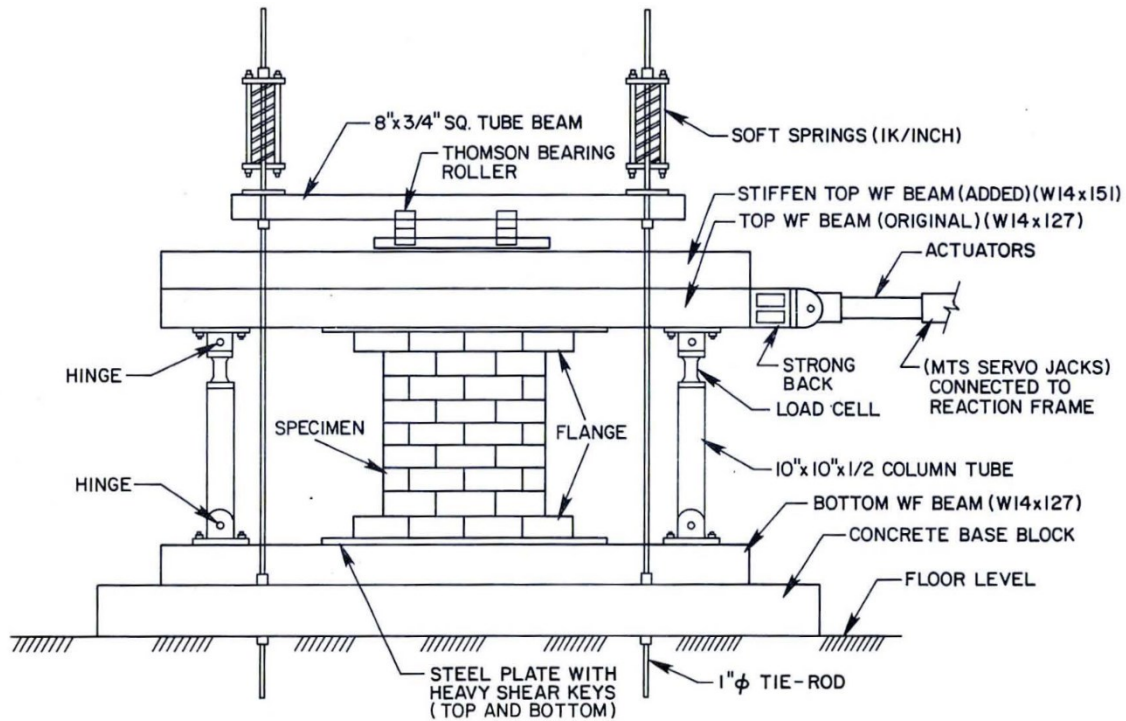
Single-Pier Test Setup (Sviensson et al., 1981)
